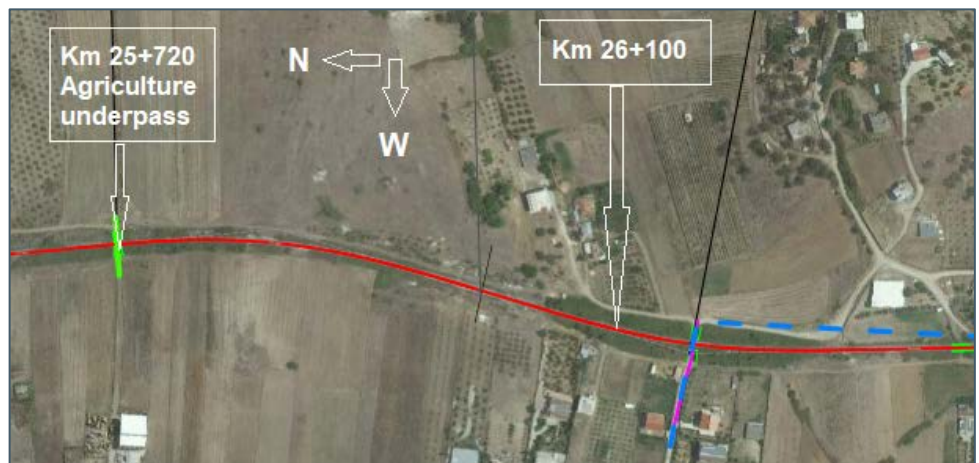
Railway line section from km 25+700 to Km 26+100
